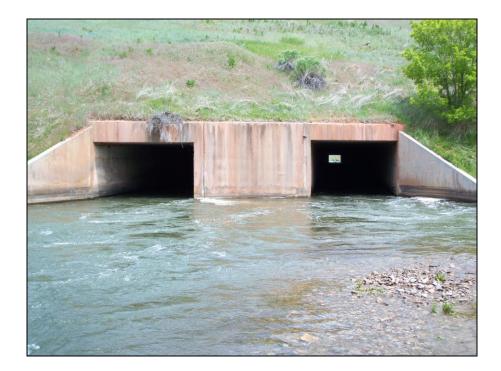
Diamond Fork Culvert #2 Outlet (Diamond Fork Field Verification Site)
